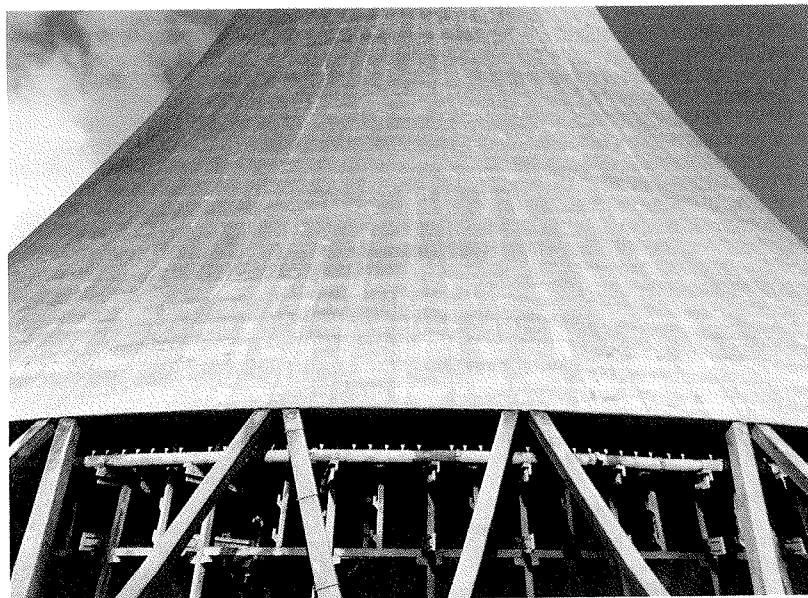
Cooling tower showing the shuttered concrete hyperbolic form supported by piloti
